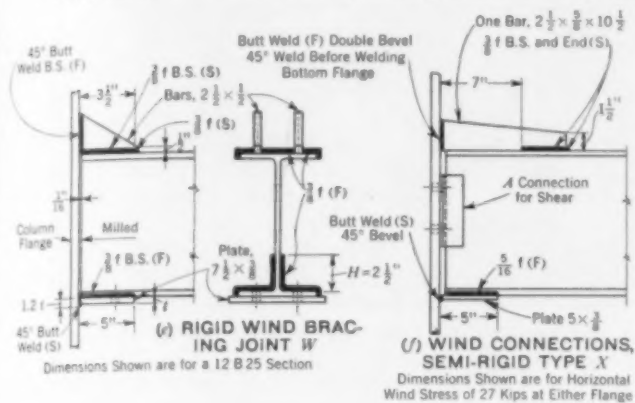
CONNECTION DETAILS, WITH DIMENSIONS FOR TYPICAL DETAIL OF EACH SERIES
